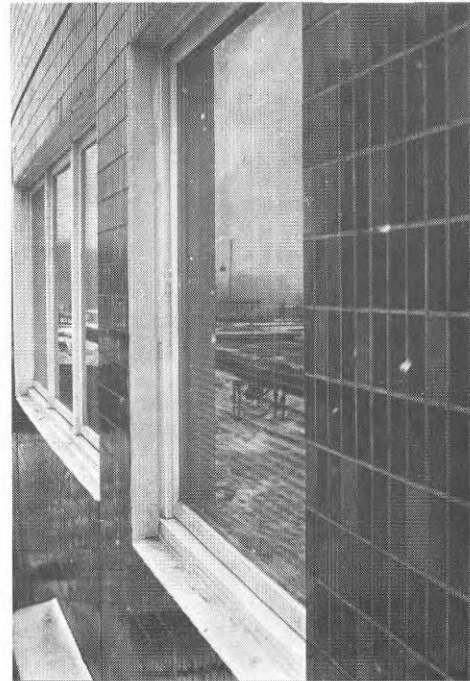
Undrained joint at top window frame. Seepage water which has collected at the joint has slowly penetrated outwards through the concrete and deposited lime on the frame. The facade exhibits external and internal damage due to moisture.
